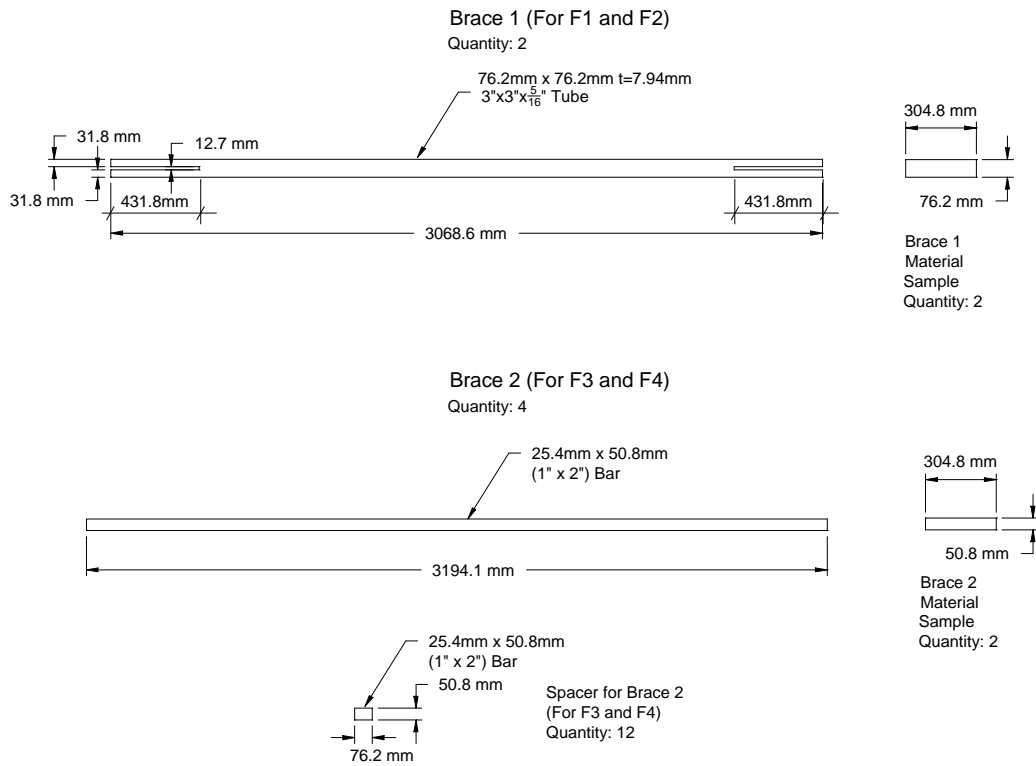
Details of Steel Brace Members for the Specimens
